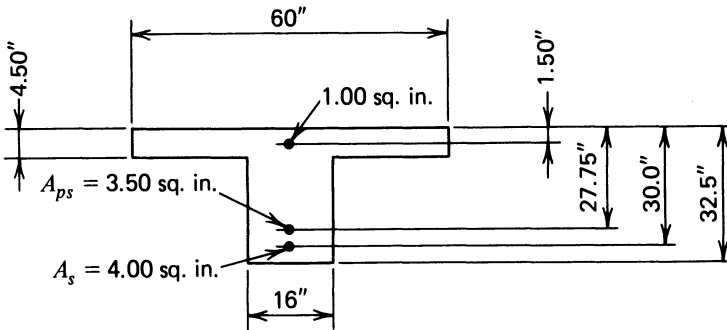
Cross section of T-beam having compression reinforcement.
